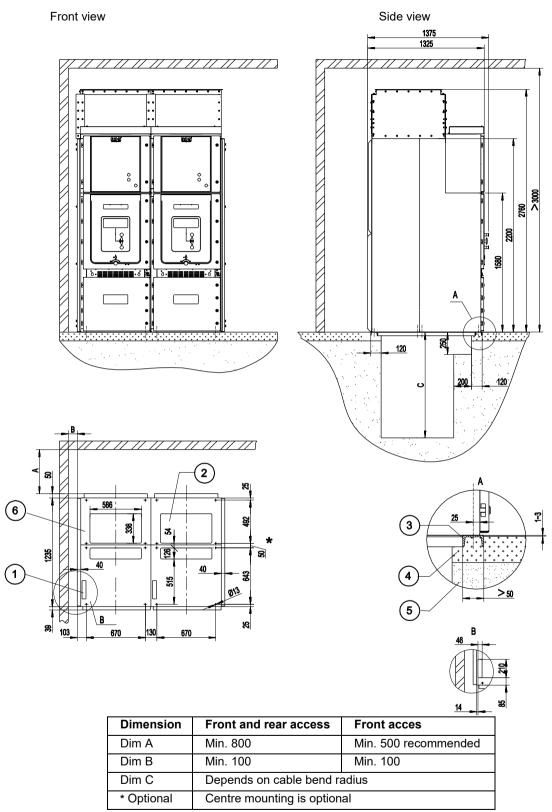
Basic floor plan for bottom cable entry panel rating 17.5kV 2000A 40kA (26.3kA-1s IAC)
